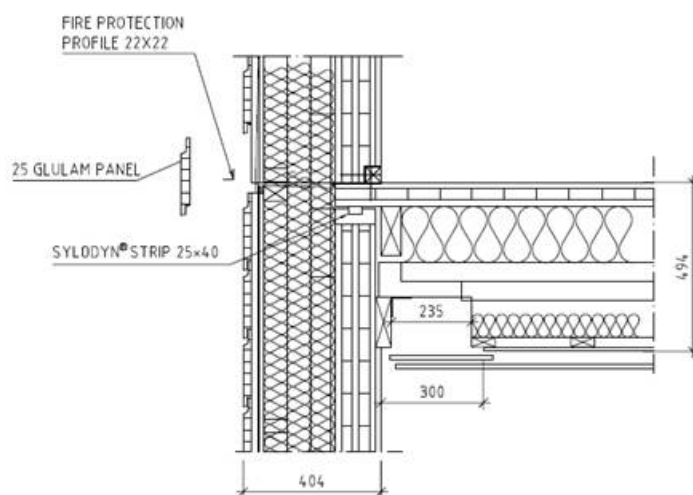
Figure showing how Martinsons connect their timber floors to the exterior wall.⁶
